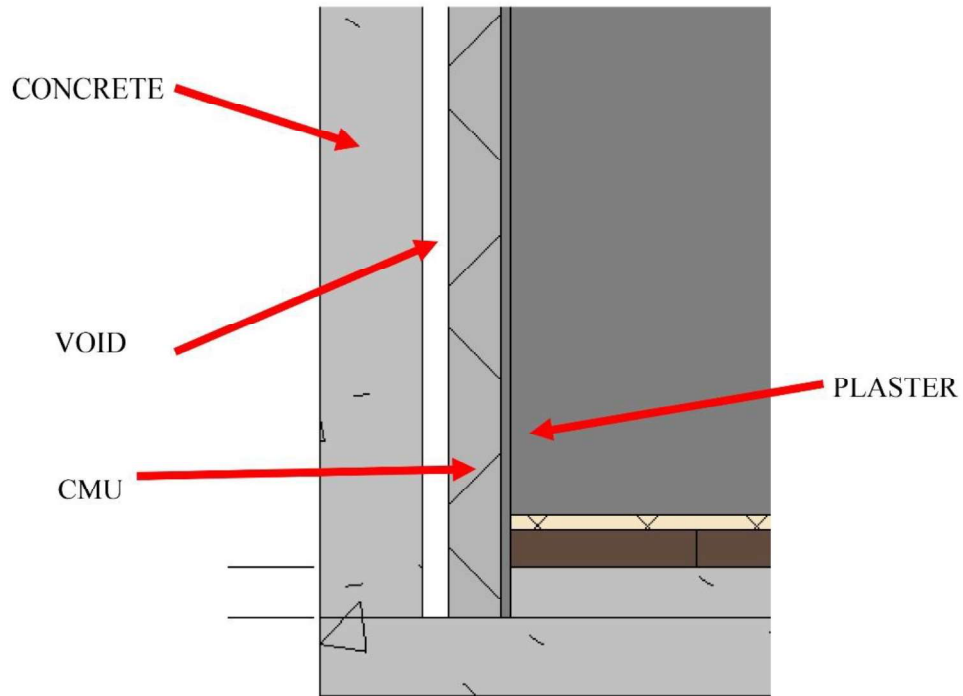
Wall section showing construction materials. Source: Revit Autodesk 2020 by Author
